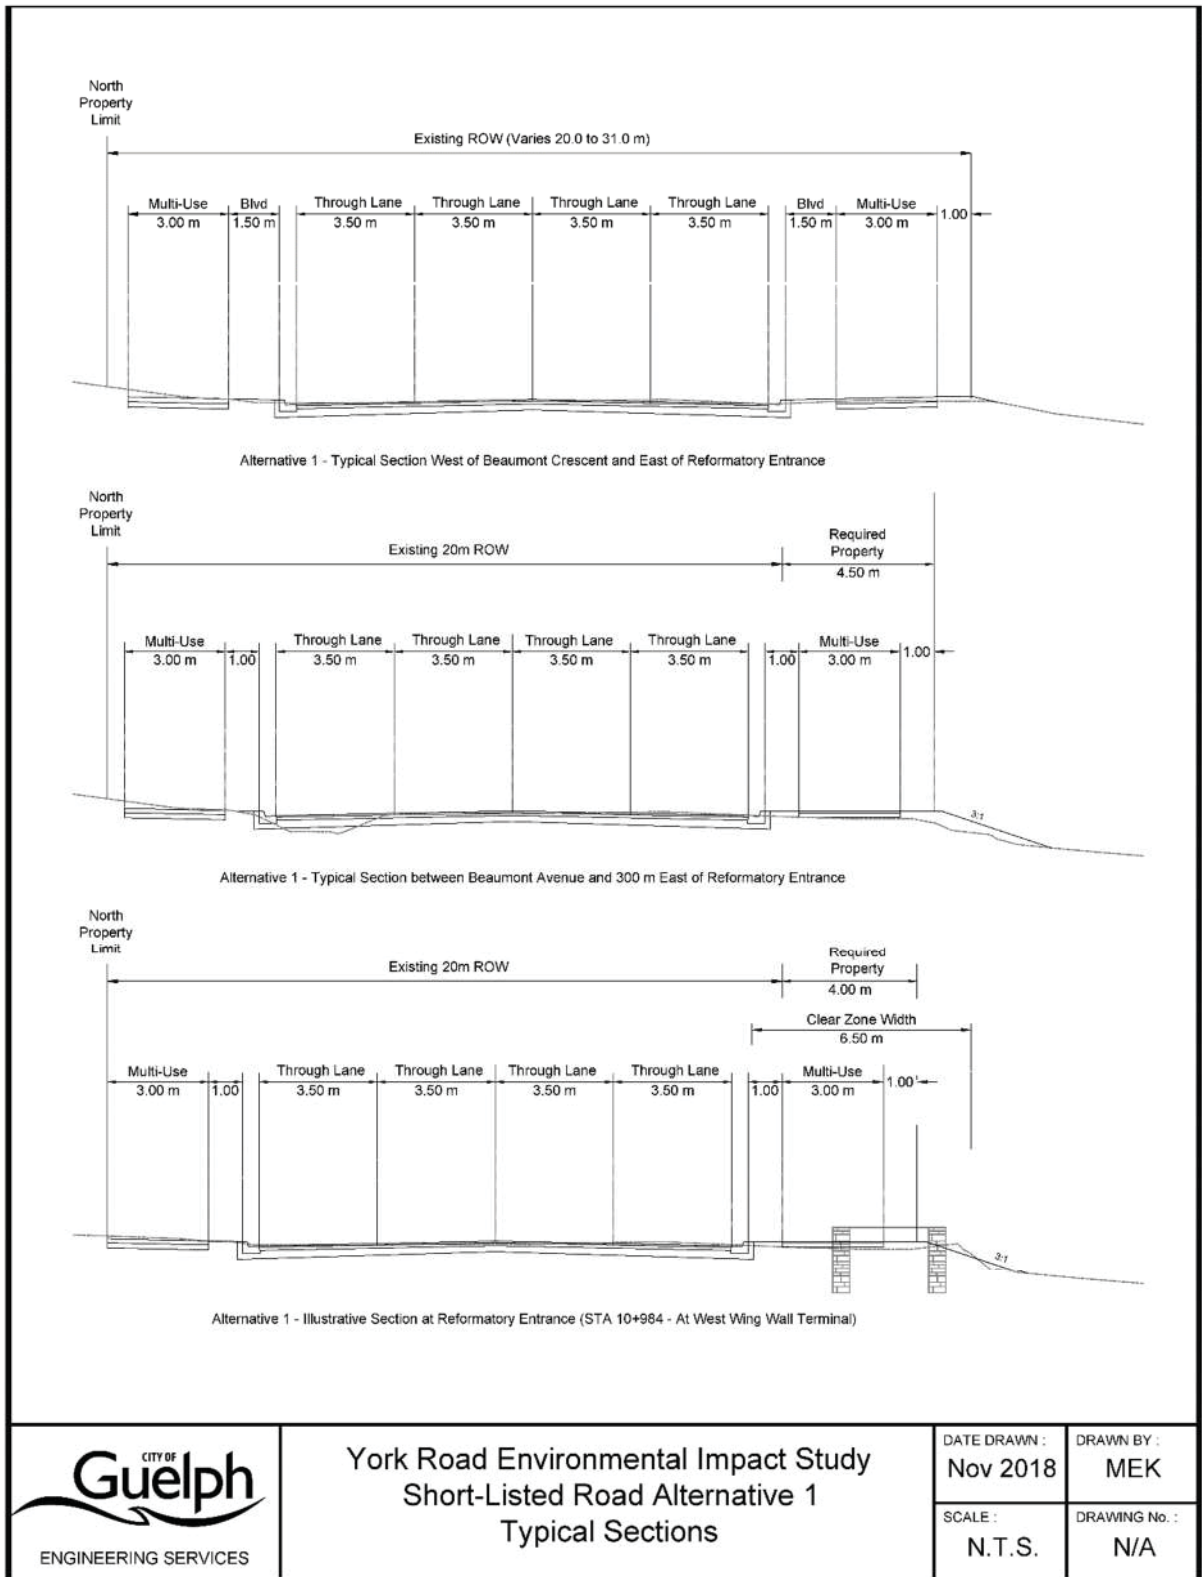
Typical Roadway Cross-Section for York Road Alternative 1.
